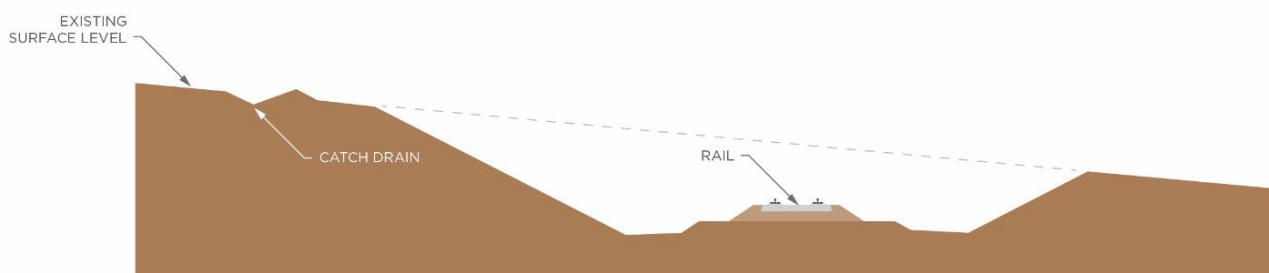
TYPICAL LONGITUDINAL DRAINAGE FOR RAIL FORMATION WITHIN A CUT
